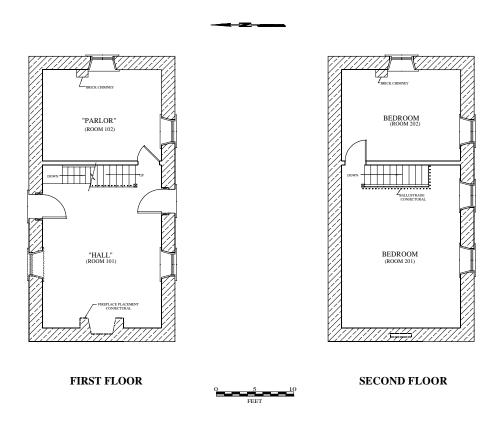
First and second floor plans of the Howarth House, showing the house as originally constructed (circa 1844).
